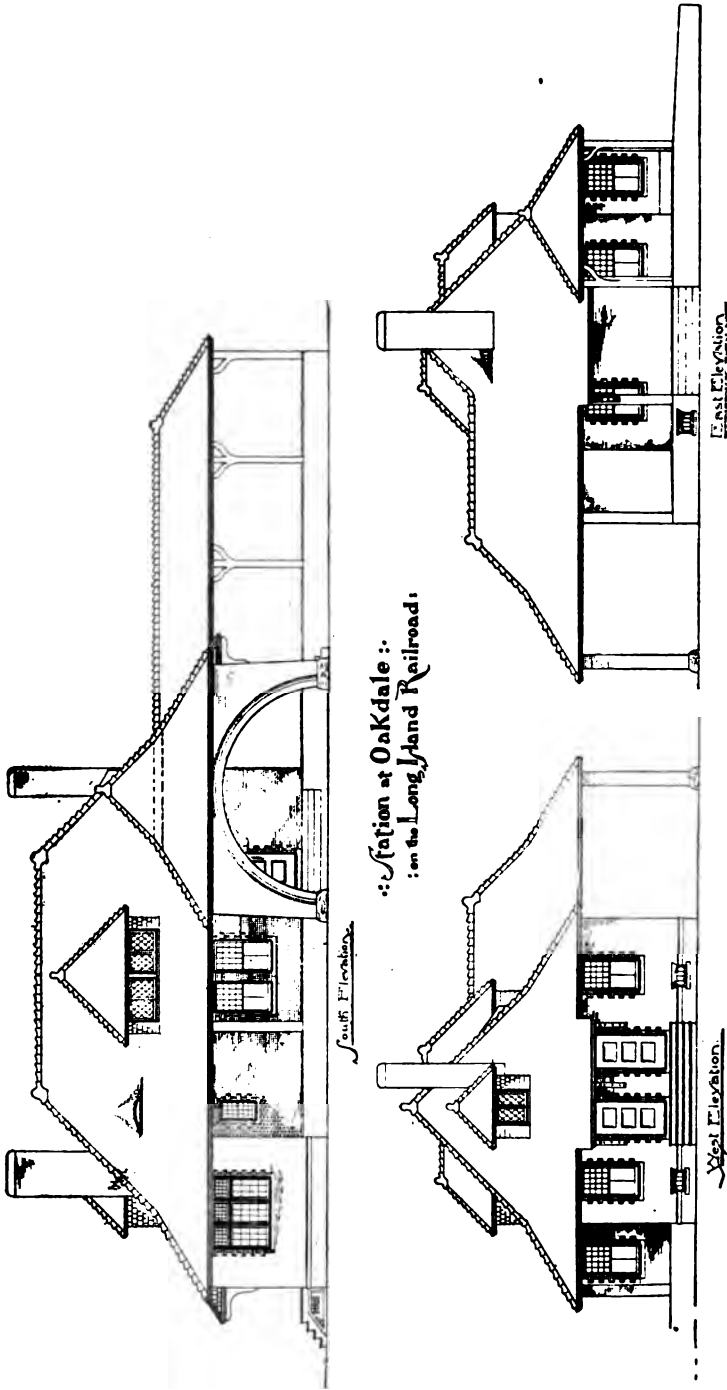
ELEVATIONS OF LOCAL PASSENGER DEPOT AT OAKDALE, LONG ISLAND R. R. (PLAN NO. 89)
